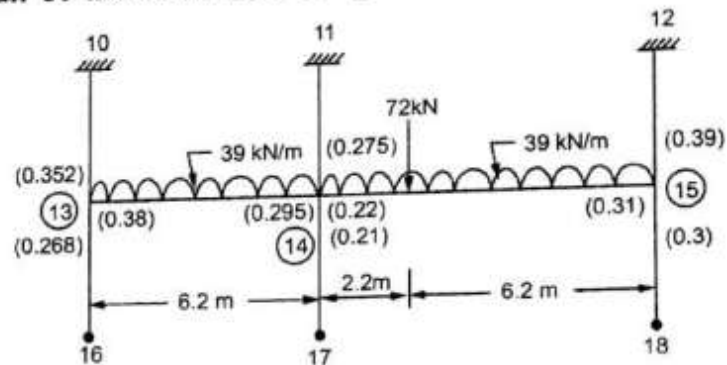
Loading Case III : Maximum Support Moment at joint 14
